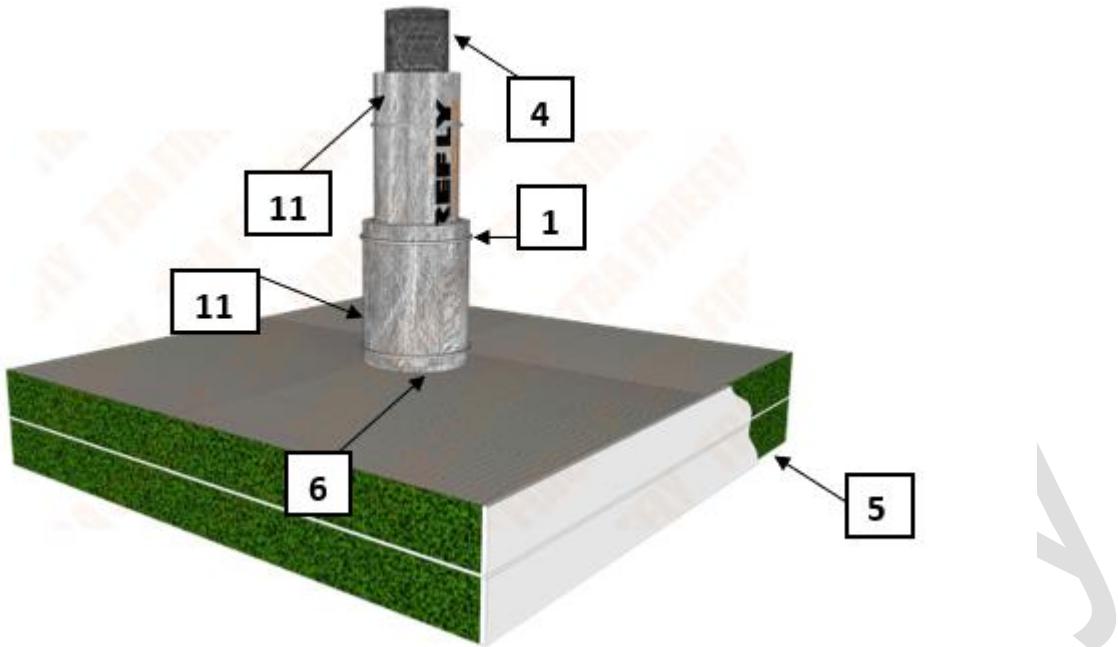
48.7mm up to 115mm OD Steel Pipe through horizontal double TBA Firefly™ Intubatt Seal
